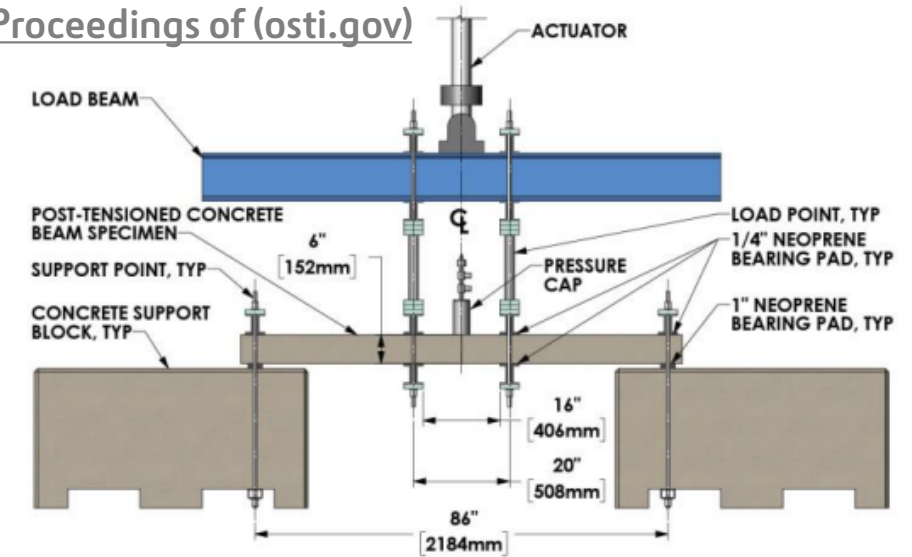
SIDE ELEVATION OF TEST SETUP
